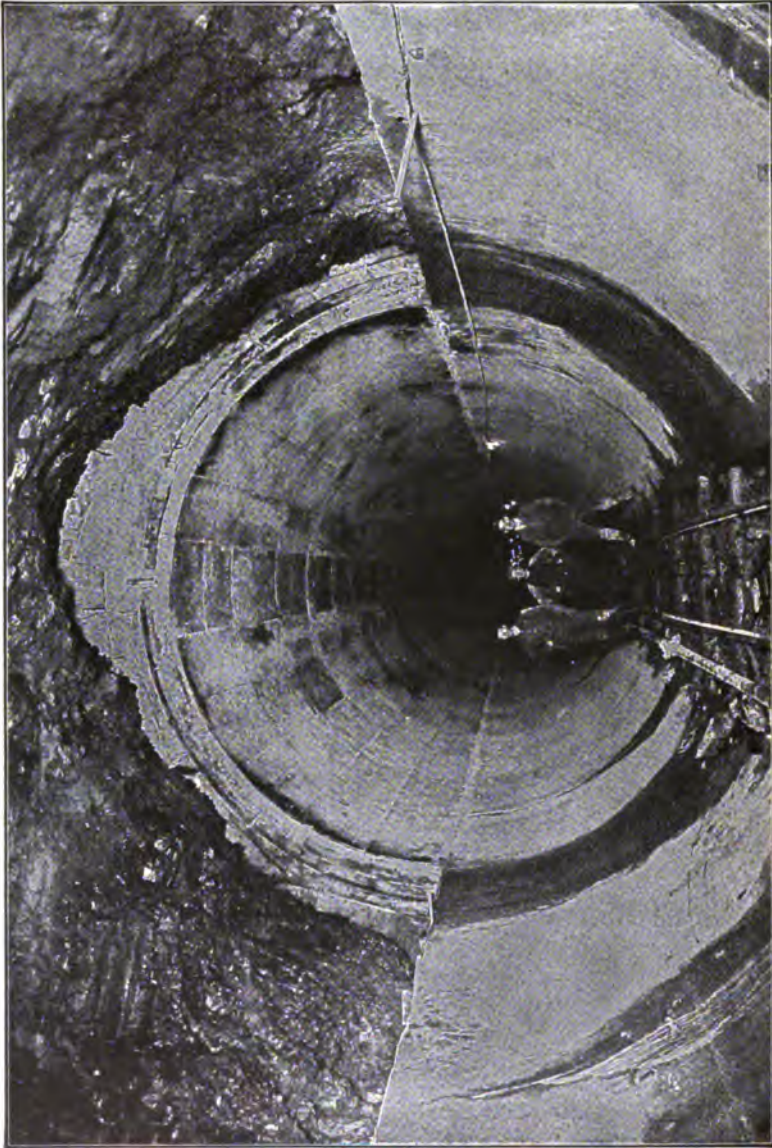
Concrete Lining of Rondout Siphon. Side walls were first placed to springing line. Above this, the arch. When possible, concrete was placed against solid rock. Note grout pipes in key.
